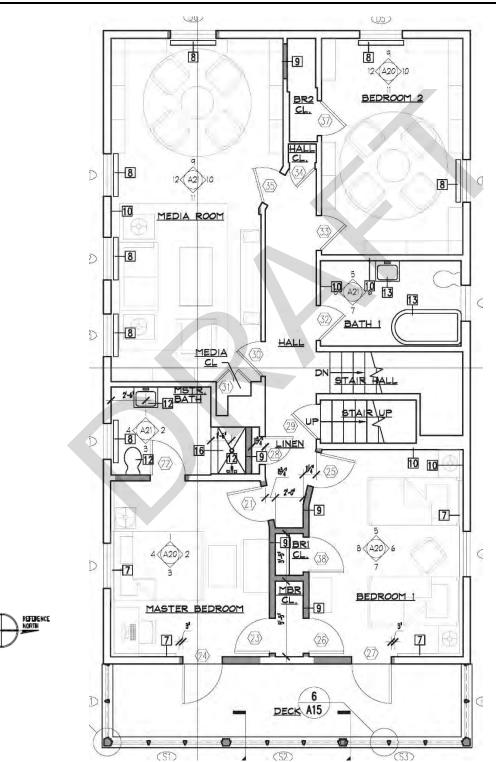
Second Floor Plan (Detail, Drawing A4, Gensler 2011)
